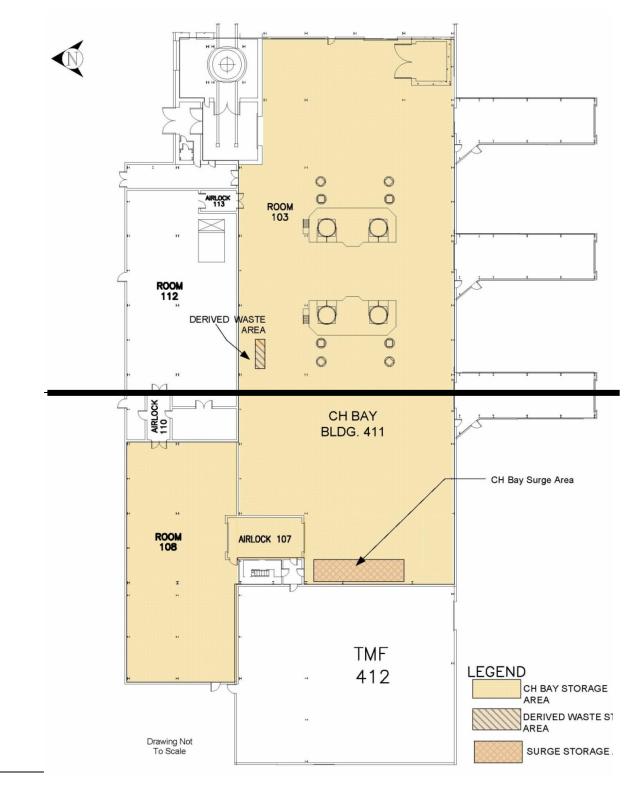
Waste Handling Building - CH TRU Mixed Waste Container Storage and Surge Areas
